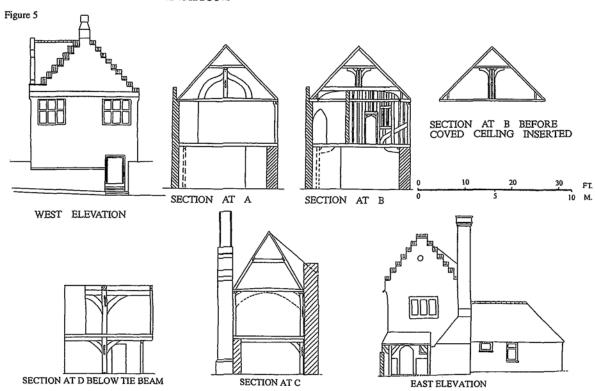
Ford Place Wrotham: Sections and End Elevations
